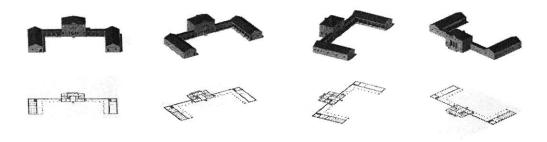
Villa Zeno animated with an animated floor plan below
